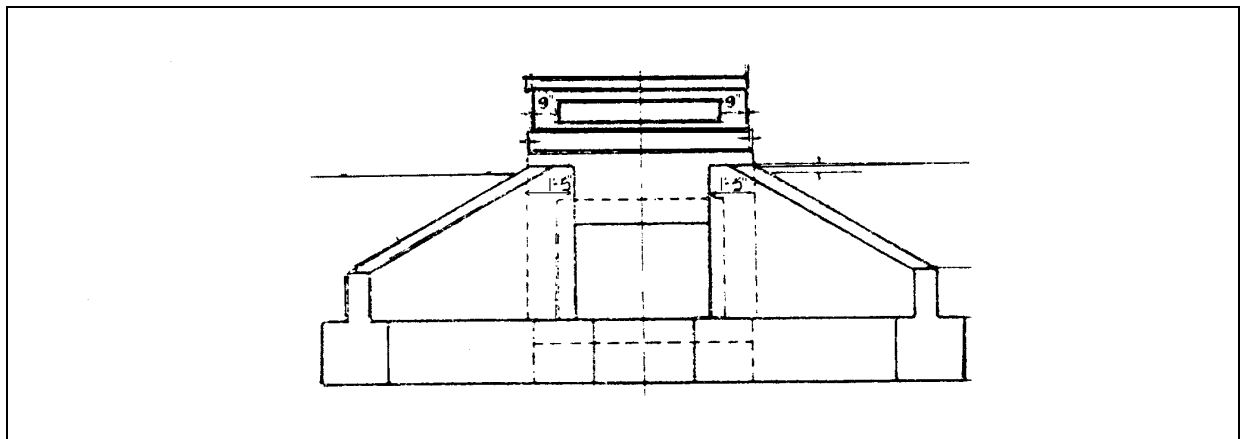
Box culvert from 1931 Standard Plans (Maryland State Roads Commission 1931). Note incised parapet.
